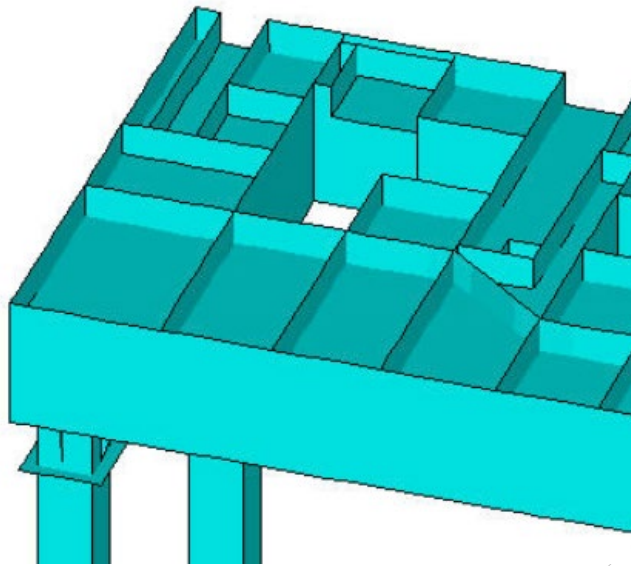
TYPICAL ARRANGEMENT OF STIFFENERS IN STEEL FOUNDATION DECK
